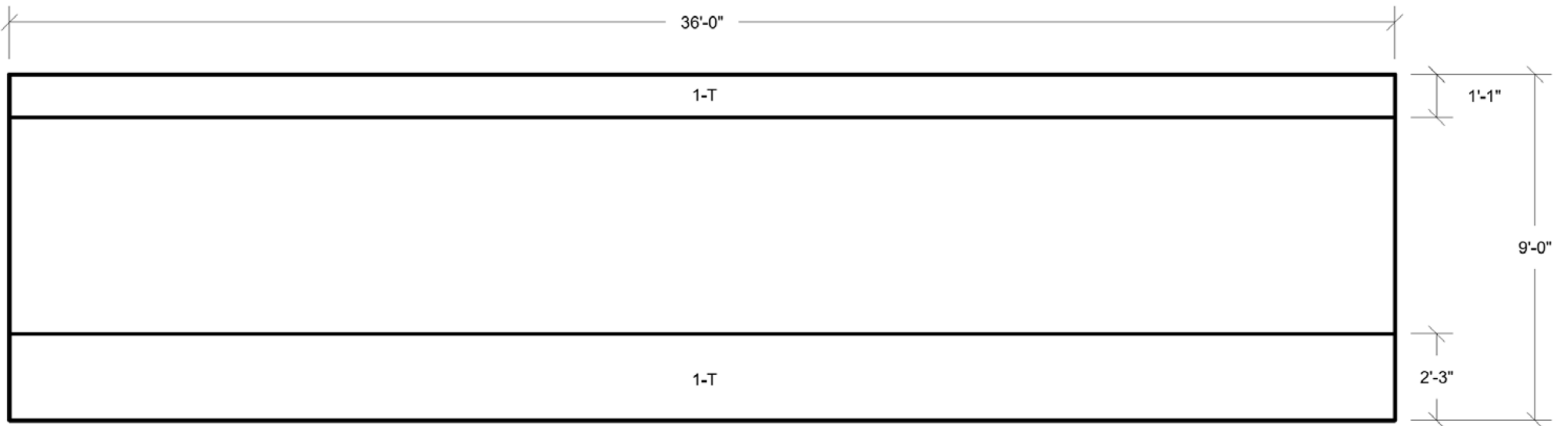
H.7-14A Tunnel Walls Looking From Outside Transverse Reinforcement Zones
